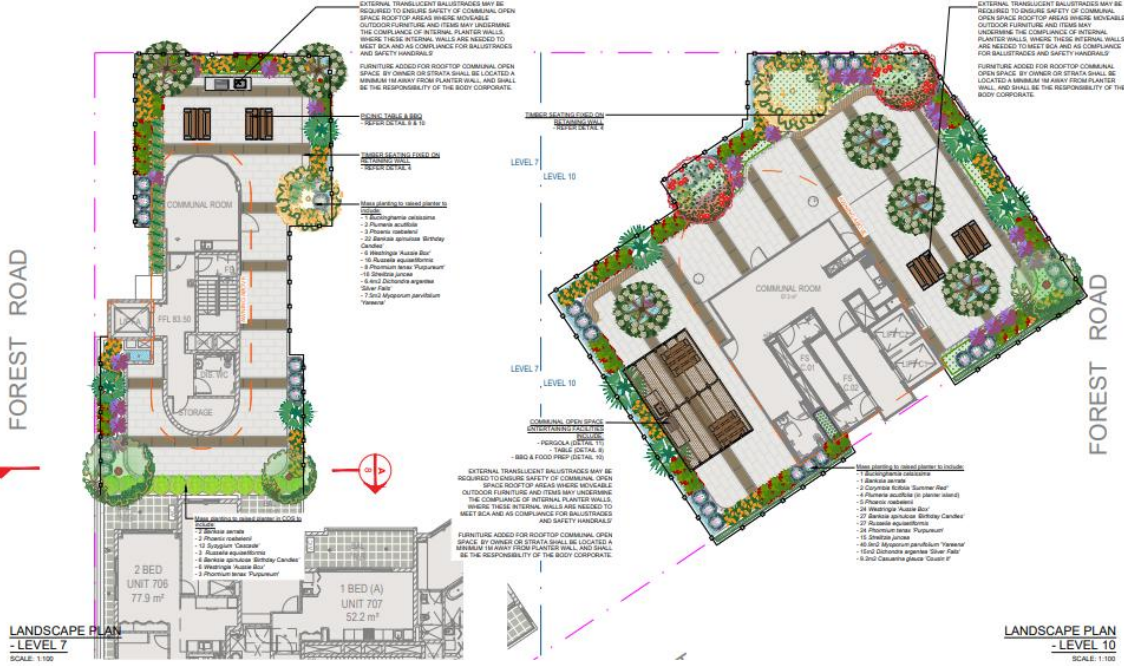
Level 7 and Level 10 landscape plan showing the barbecue area, picnic tables and raised planters around the perimeter (Source: Conzept Landscape Architects, 2025)
